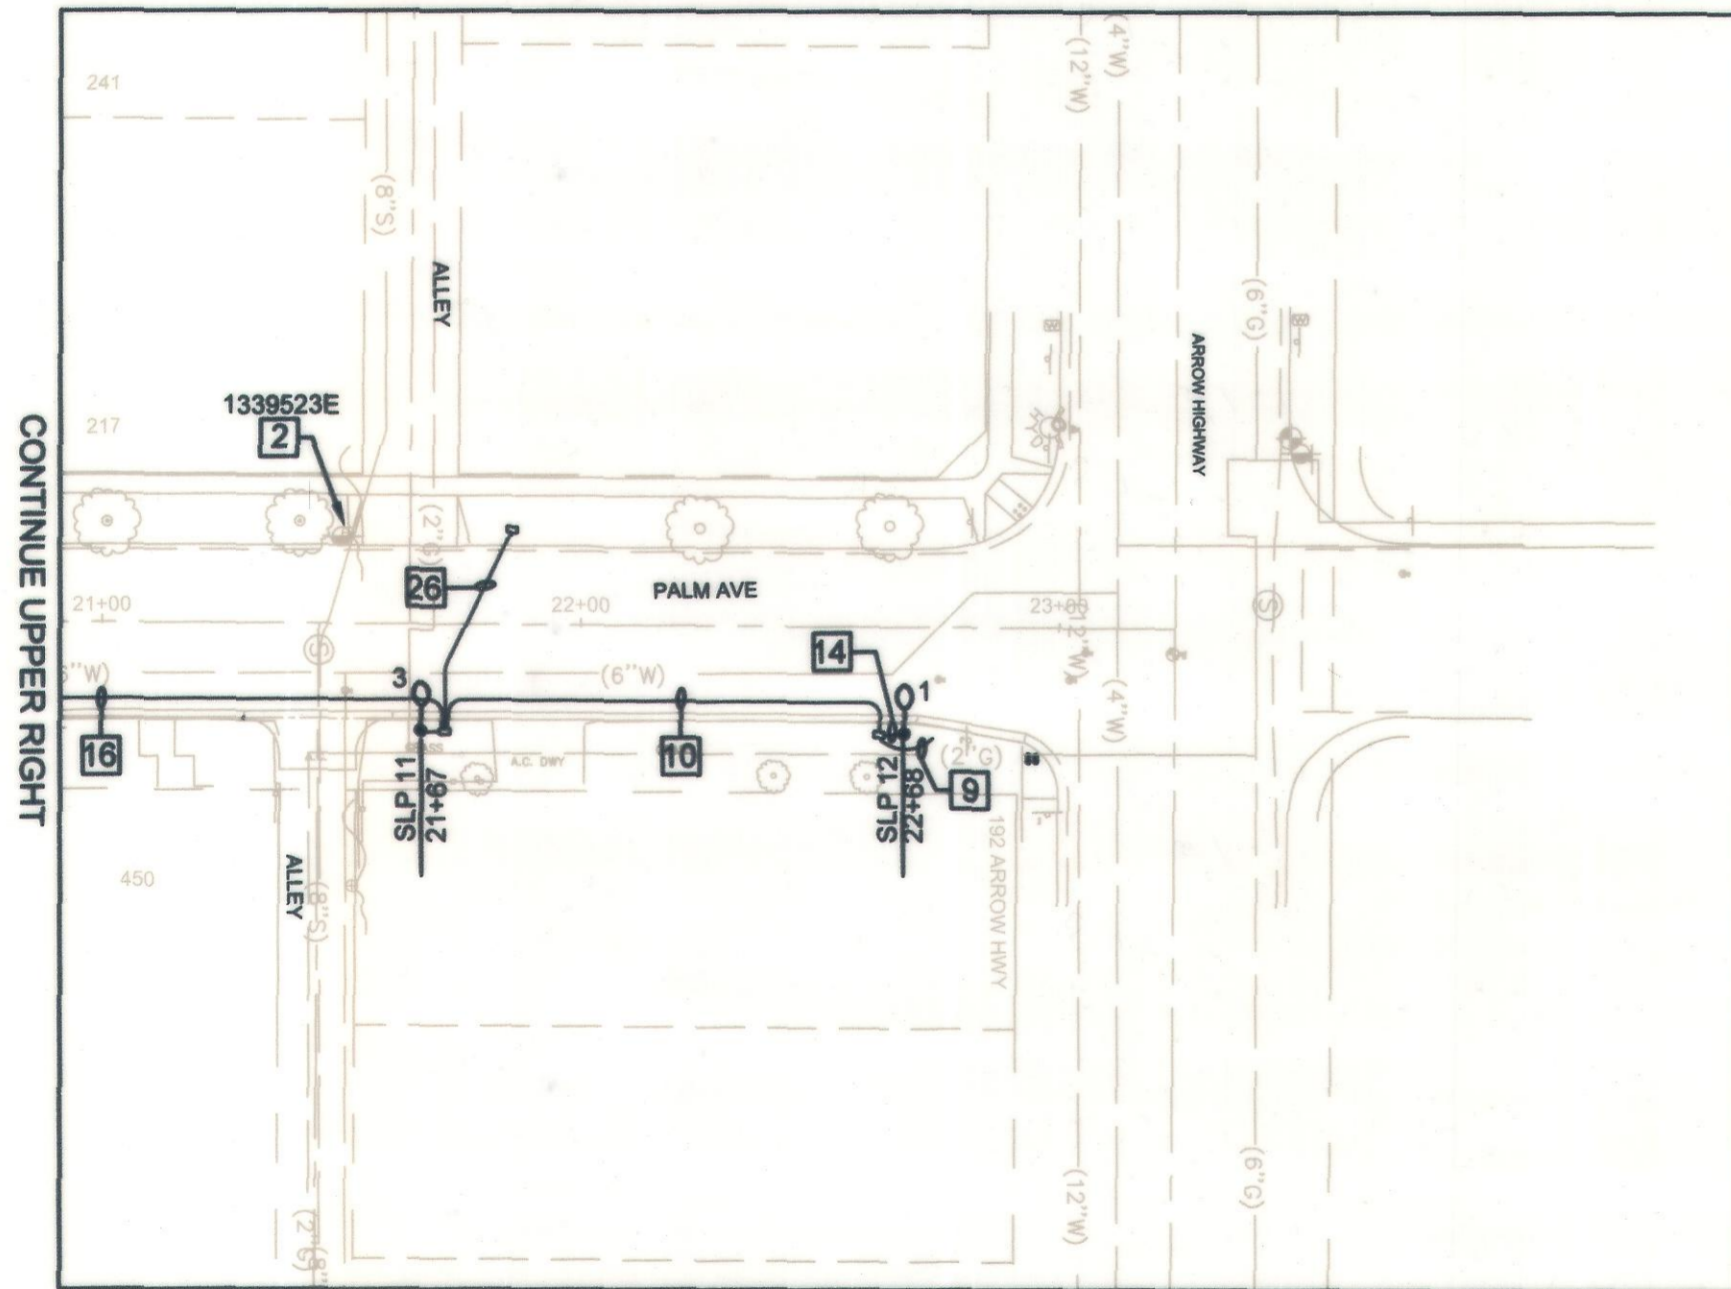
ELECTRICAL SITE PLAN- PALM AVE
